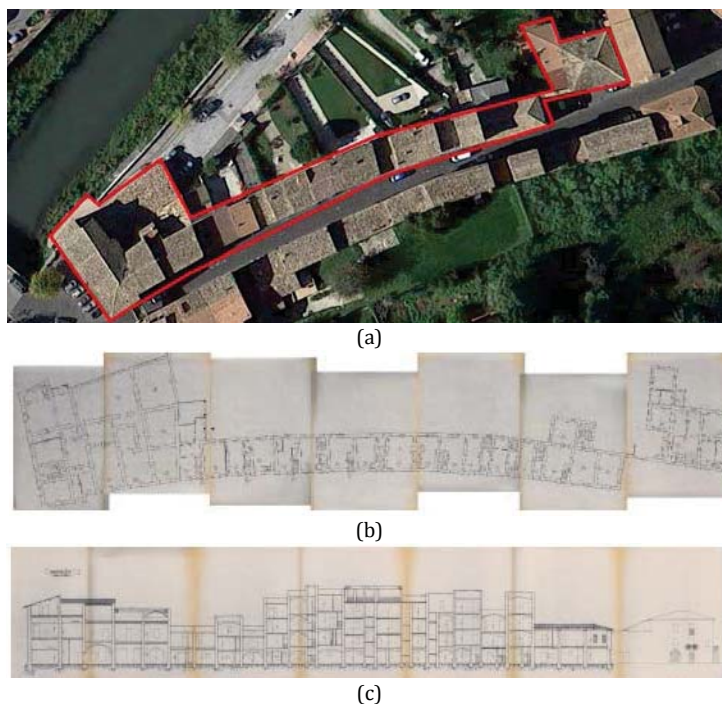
Borgo San Rocco (Italy): bird-eye view (a), first floor plan layout (b) and structural section (c).
